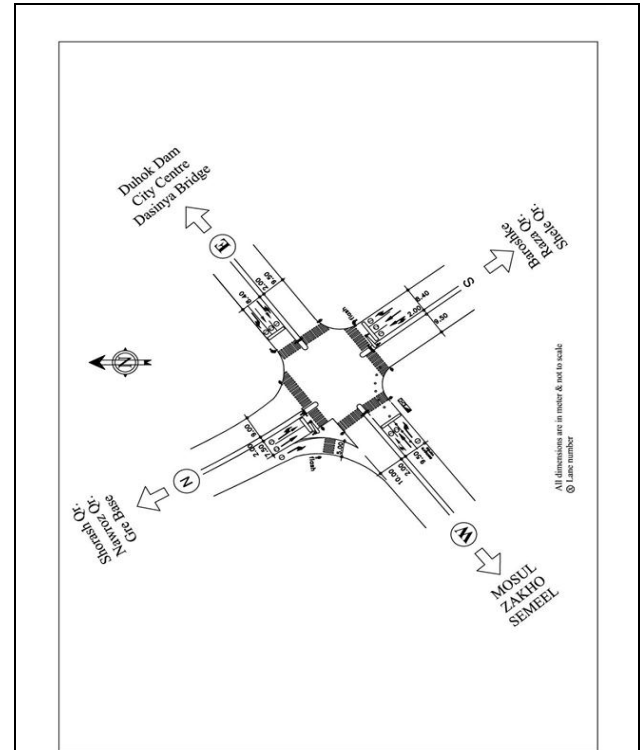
Azadi Intersection (A) Plan (Directorate of Traffic, Traffic Engineering Department, Duhok City, 2009)
